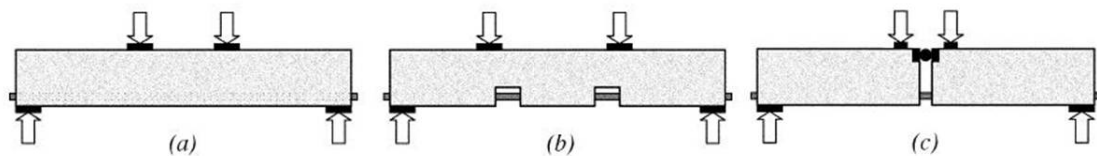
Configurations of flexural bond test set-up (a) simple beam test; (b) notched beam test; (c) hinged beam test (ACI.440R-07)
